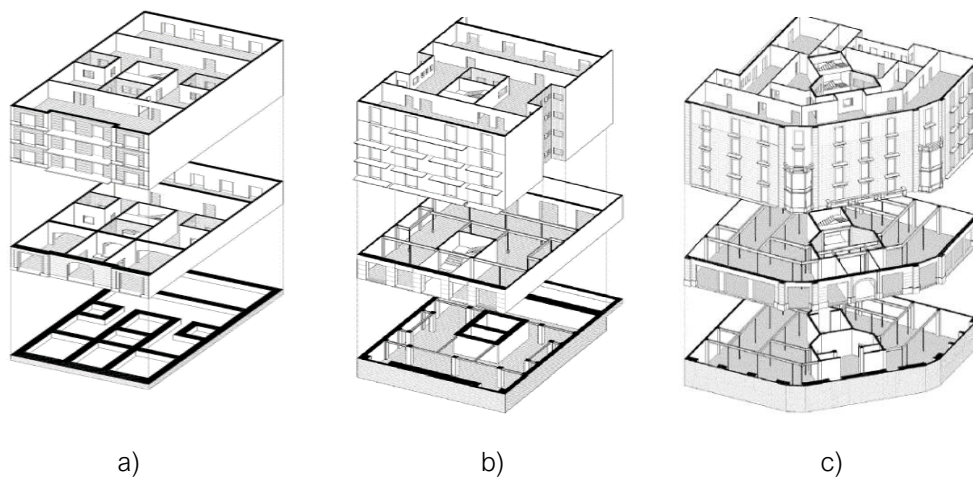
Different structural systems (Paricio Casademunt, 2001): a) homogeneous system of slender walls; b) hybrid system – concrete columns and masonry walls; c) hybrid system – steel columns and masonry walls.
